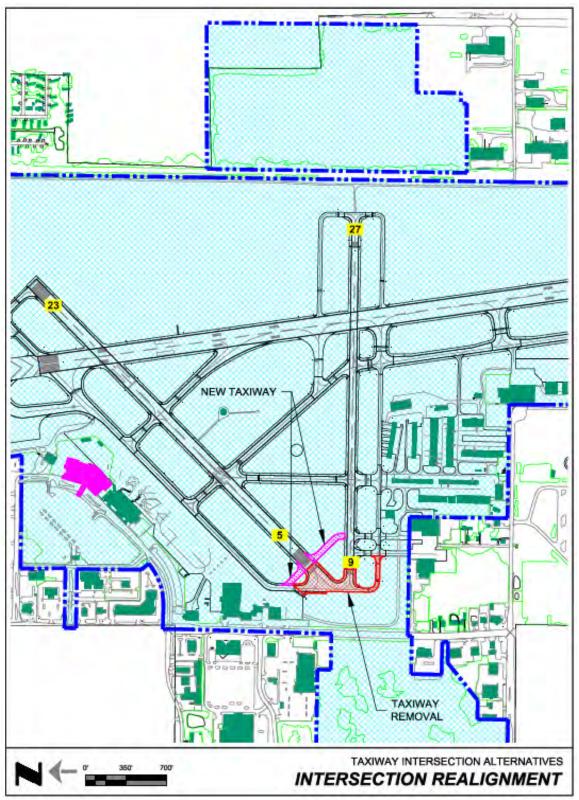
Alternative 8 – Taxiway Intersection Realignment
